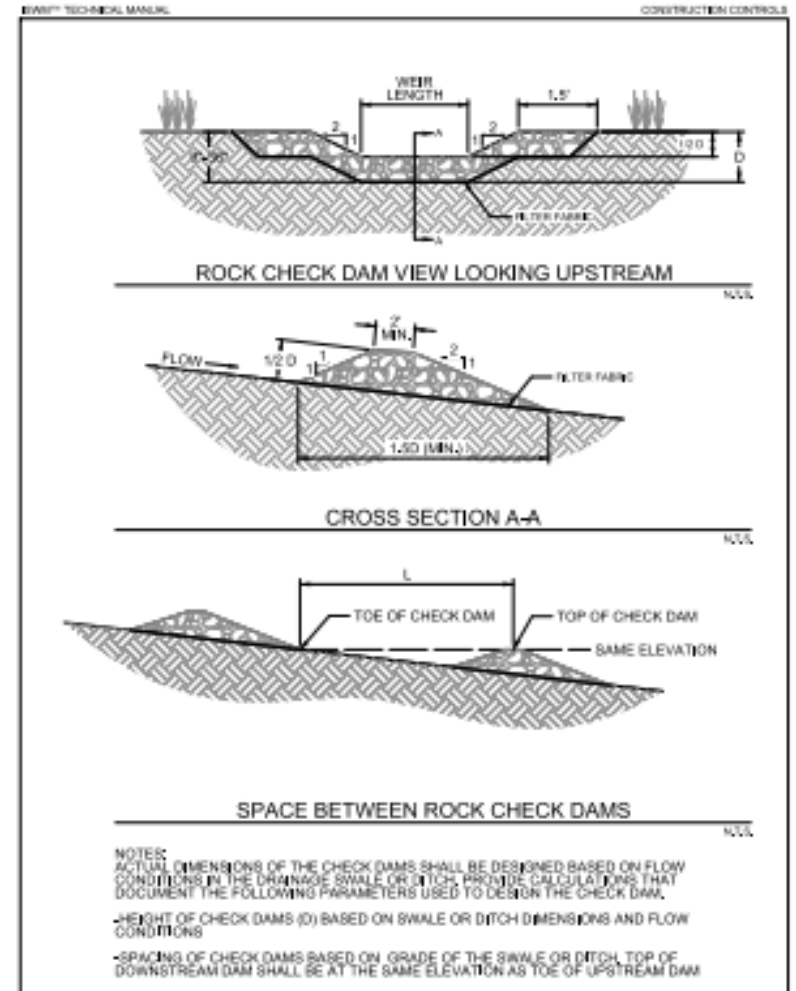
STANDARD CONSTRUCTION DETAIL - ROCK CHECK DAMS (1 OF 2)
